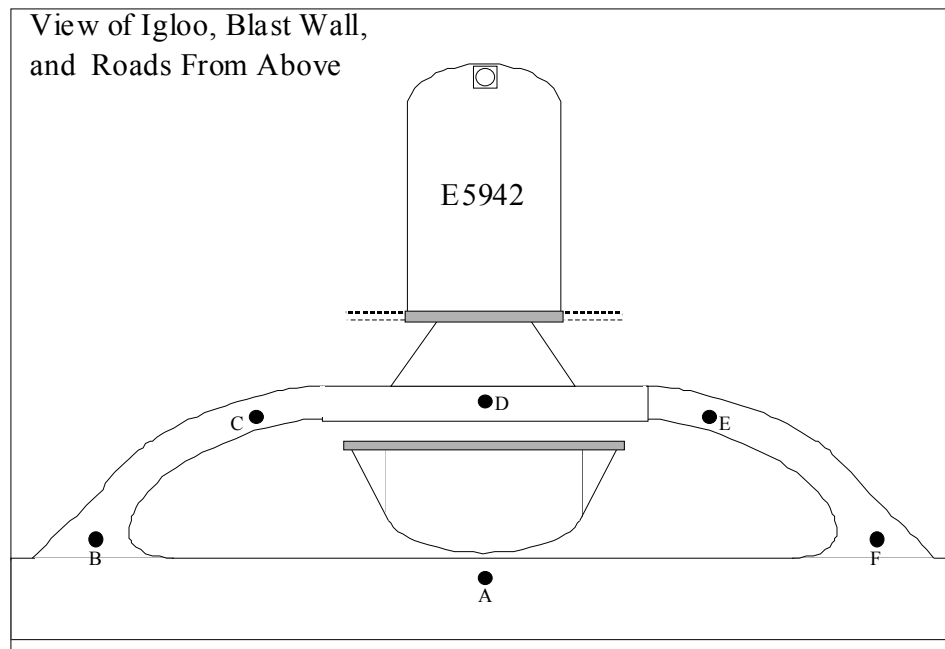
Overhead Diagram of Access Road between Bunker and Blast Wall with Lock Reading Locations
